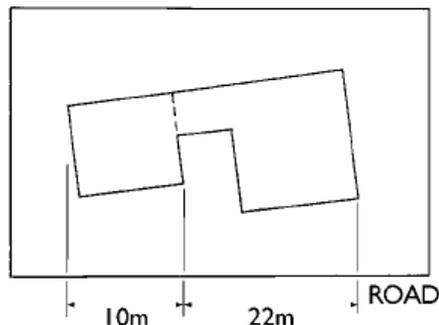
Plan view of building for calculating total sign face area
